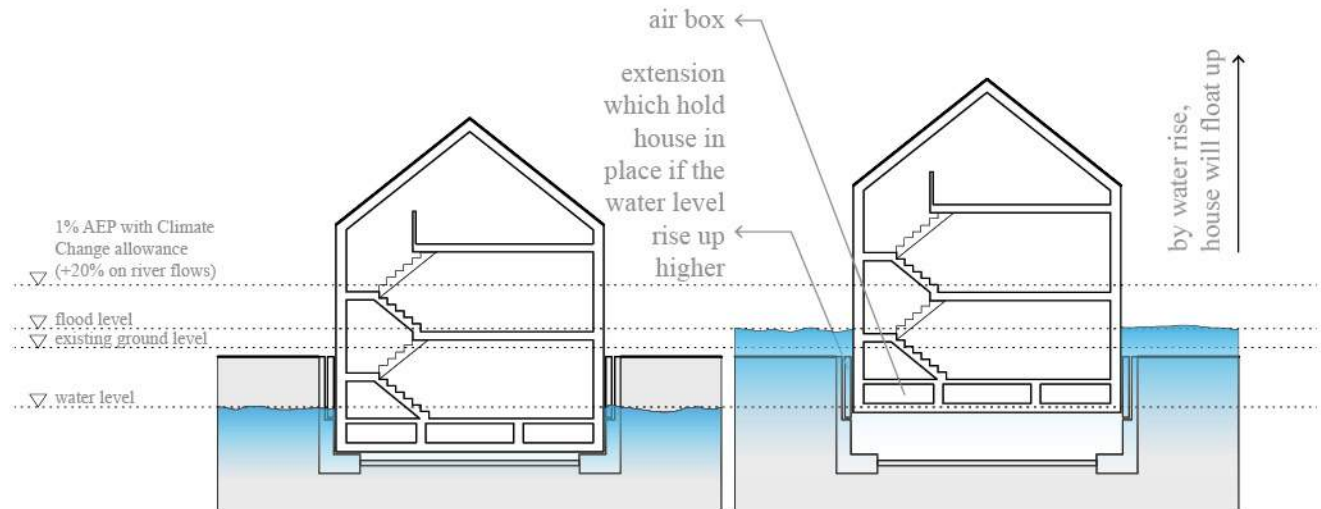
| Amphibious building by Baca Architects case study [not to scale]
